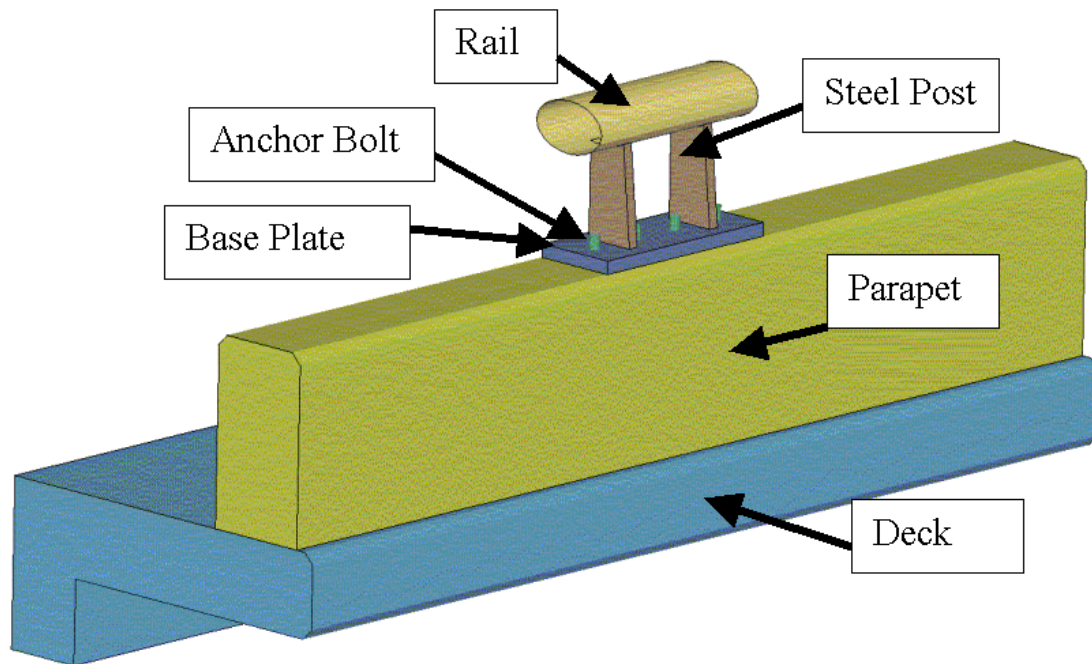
Model of T4 bridge rail specimen with four-bolt anchorage and 254-mm- (10-inch-) wide parapet.
